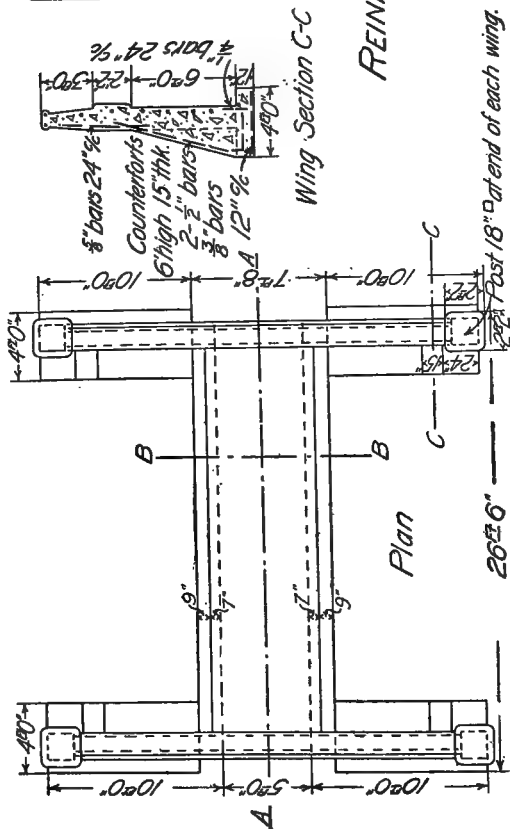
REINFORCED CONCRETE BOX CULVERT AT LENOX, MASSACHUSETTS.
